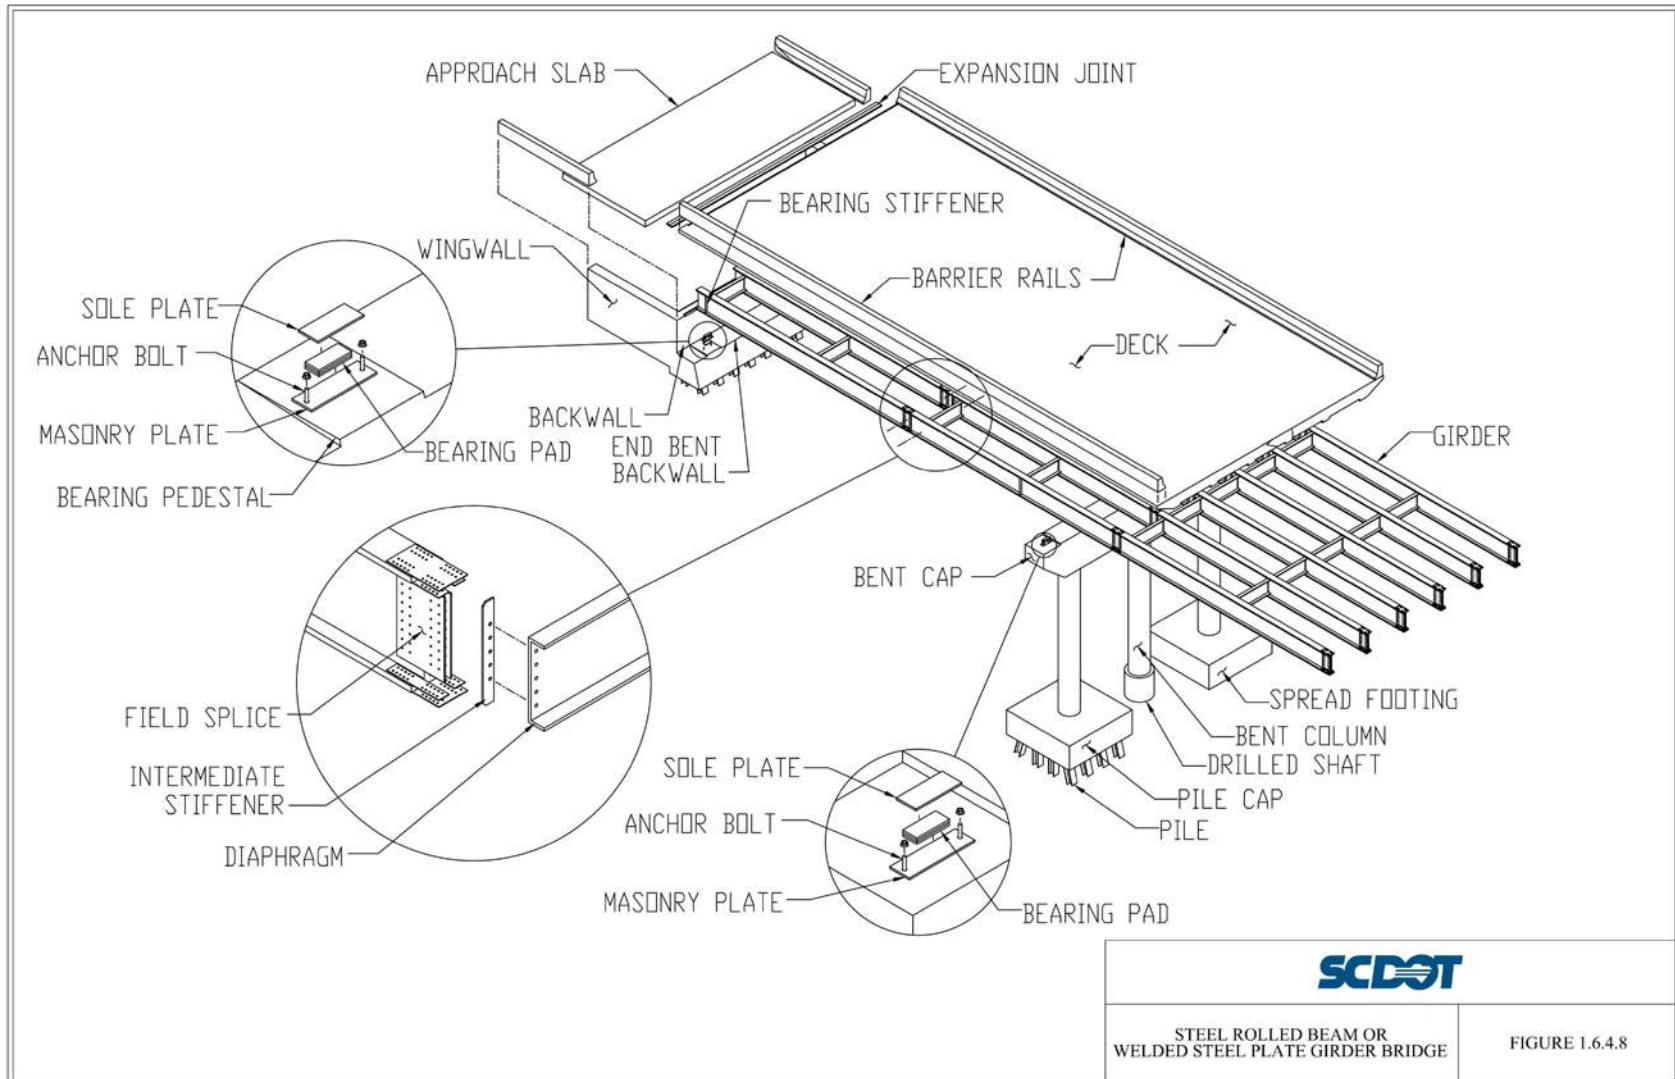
Steel Rolled Beam or Welded Steel Plate Girder Bridge Components
